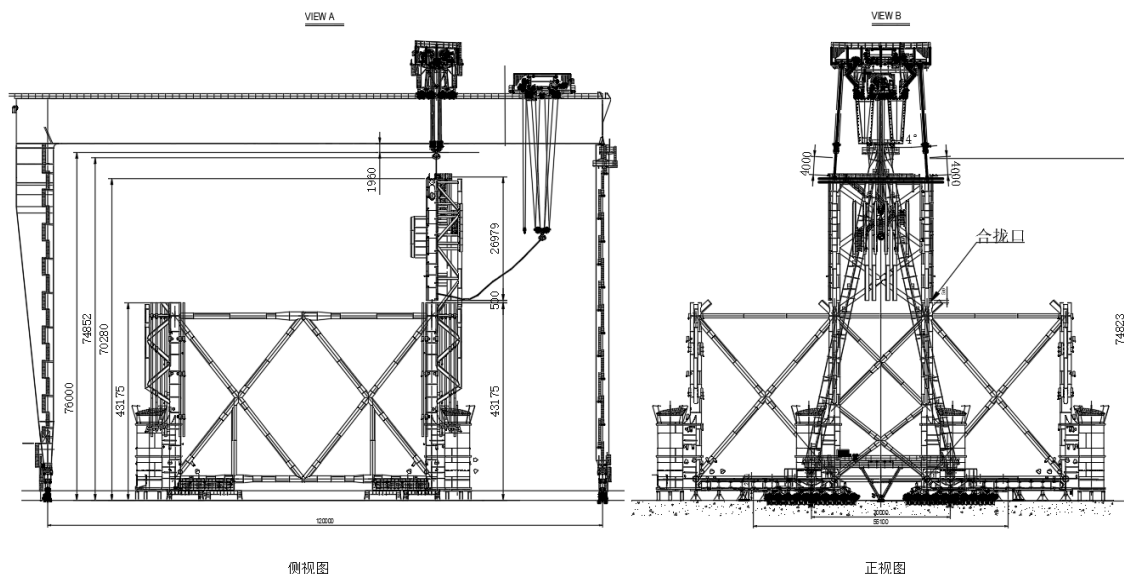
Schematic diagram of jacket lifting and welding
